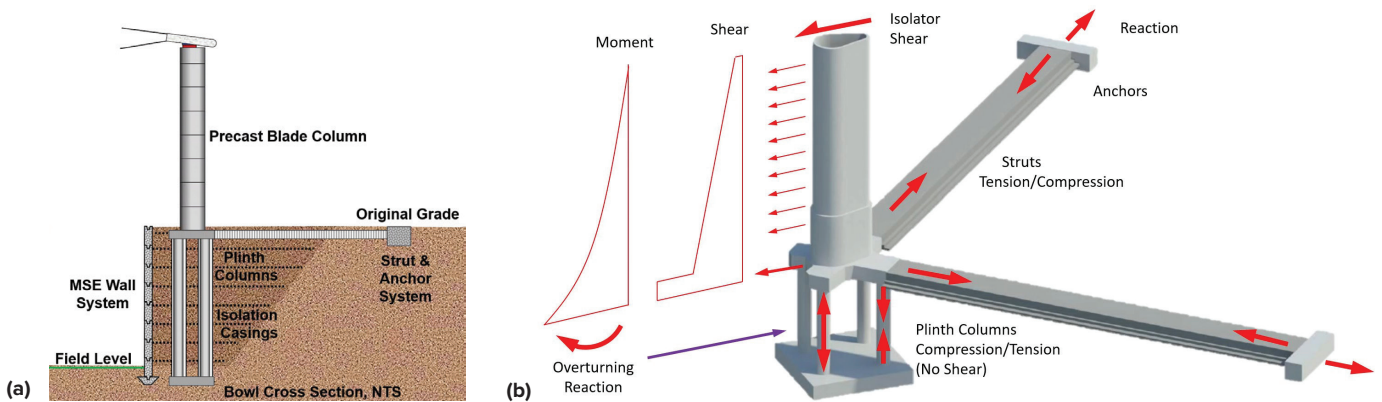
Schematics of the MSE and blade columns of the roof support structure: (a) blade columns are supported by plinth columns, which were isolated from the MSE fill; and (b) a strut-and-anchor system is provided to transfer shear forces from the roof and blade column to the soil beyond the fill
